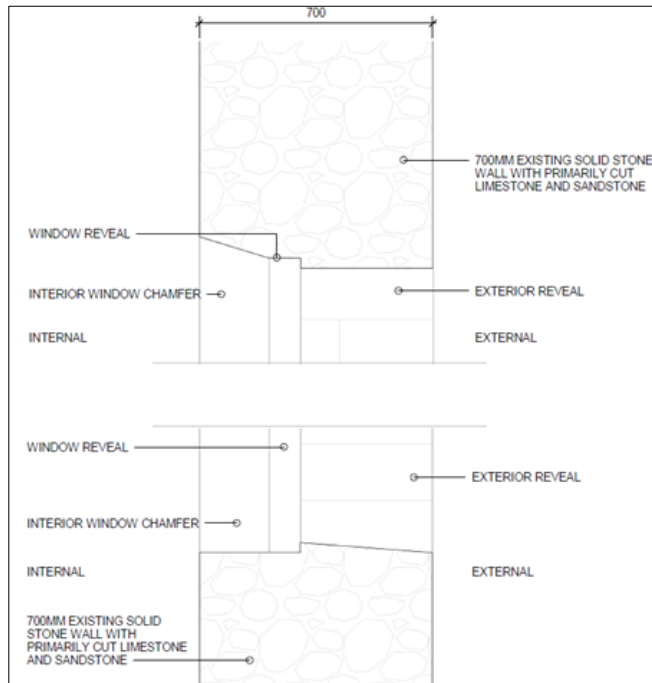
Existing Section of a Window of the Columban Hall (Source: Author).
